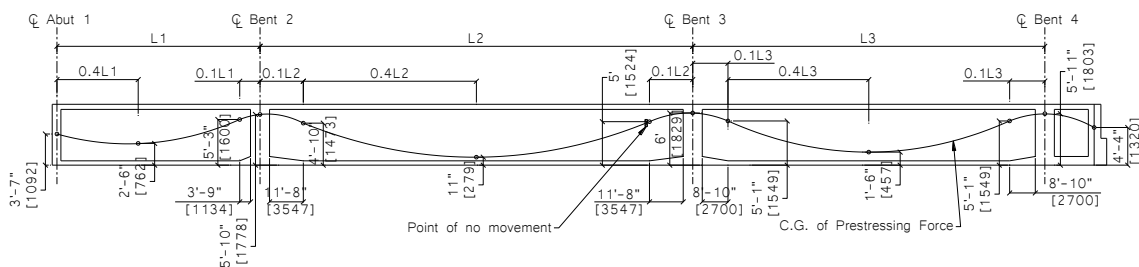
Prestressing tendons profile of Frame 1, Bridge 5EB
